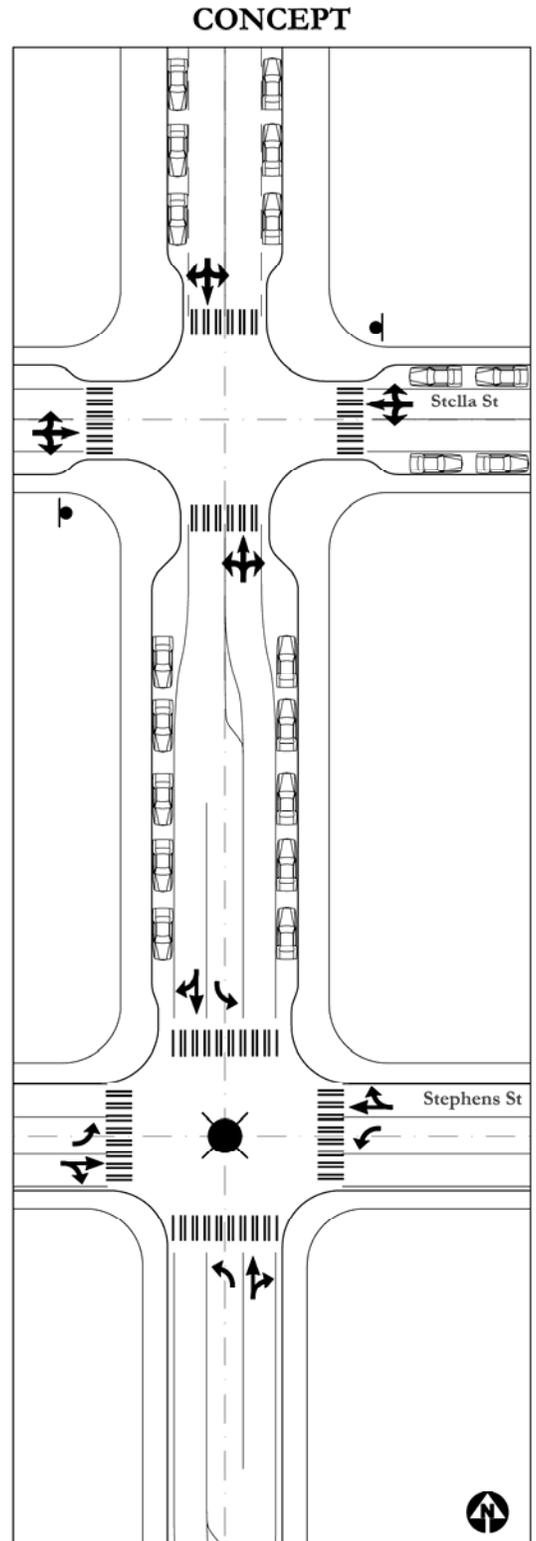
Proposed Main Street configuration between NE Stephens and Stella streets. Sidewalks here are maintained at 12' to retain on-street parking spaces.
